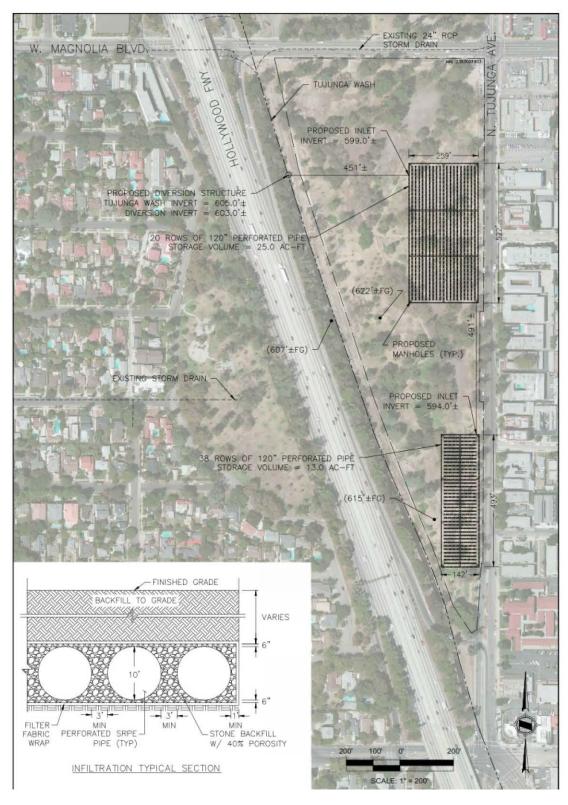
North Hollywood Park Subsurface Infiltration Concept
